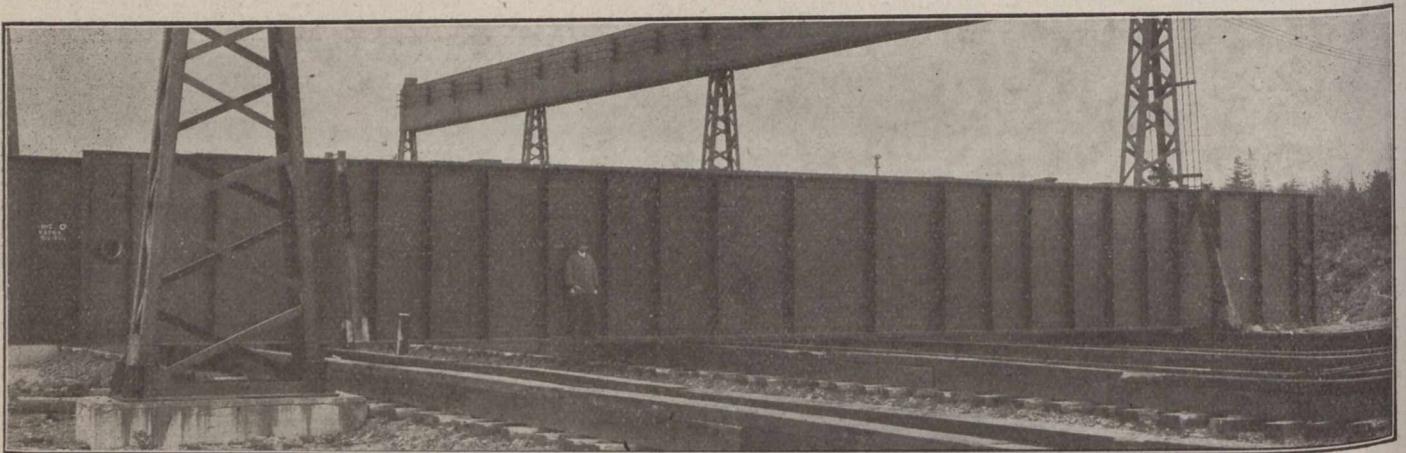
View showing one web of double floor beam at the bridge site storage yard. These girders are 10 ft. high and 88 ft. c. to c. 11-inch pins are used to connect the 60-ton floor beams to the post.
